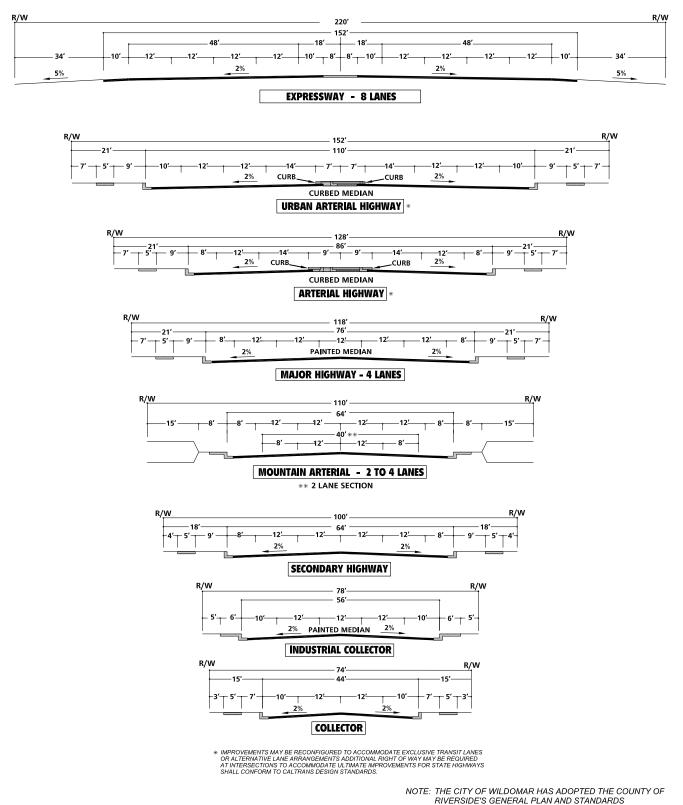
CITY OF WILDOMAR GENERAL PLAN ROADWAY CROSS-SECTIONS
